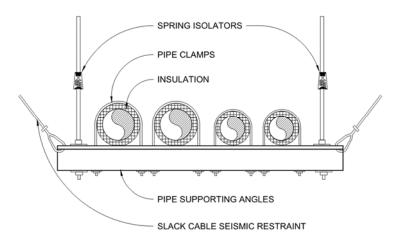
Trapeze Piping Acoustic Isolation
